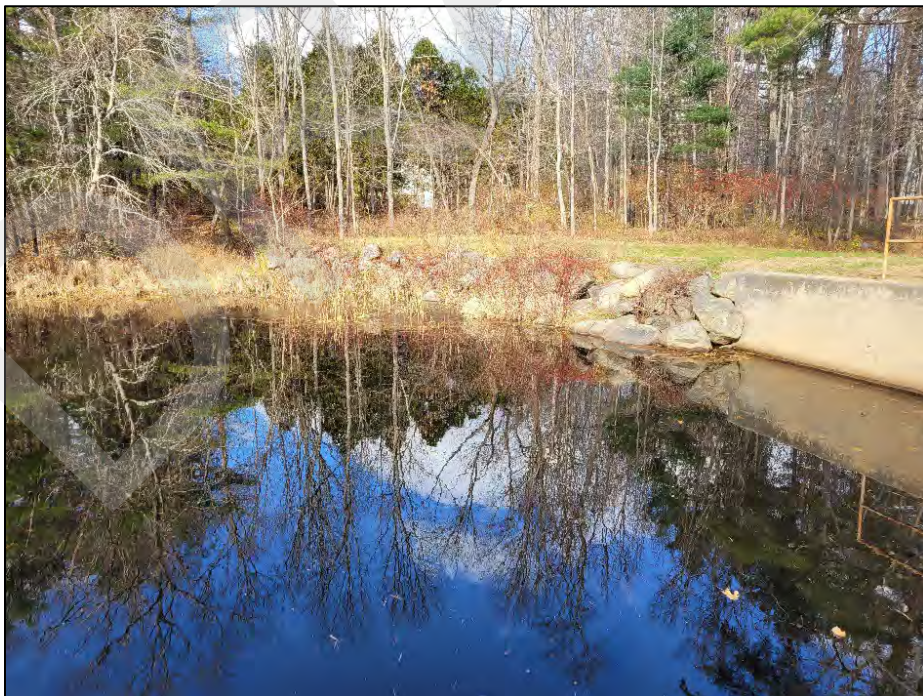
Upstream riprap at left abutment/embankment. Note vegetation growth within the riprap on the slope at the abutment.
